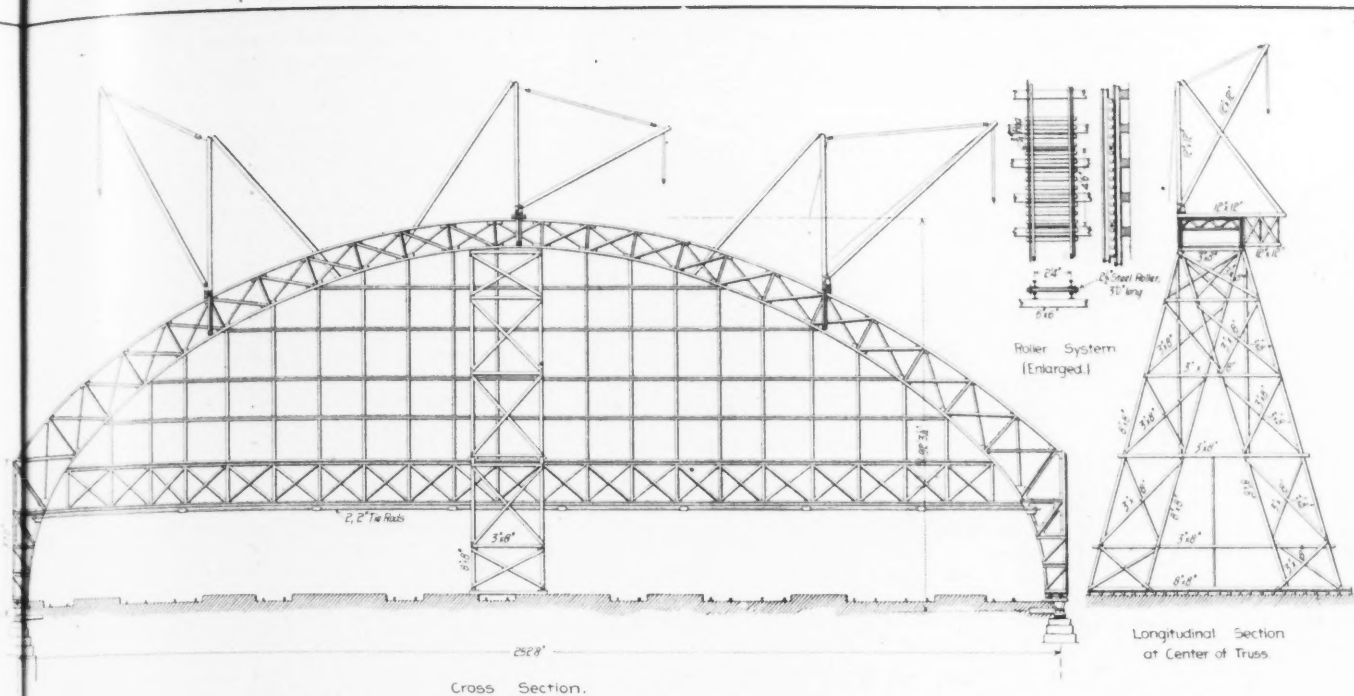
ELEVATION OF GABLE TRUSSES WITH CENTRAL STEADYING TOWER AND ERECTING DERRICKS.
